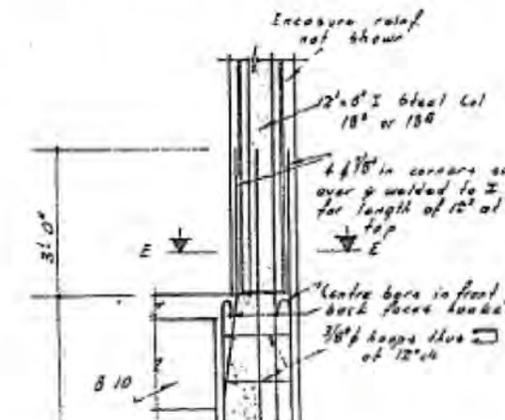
Extract of original steel mullion to foundation detail (critical connection)
